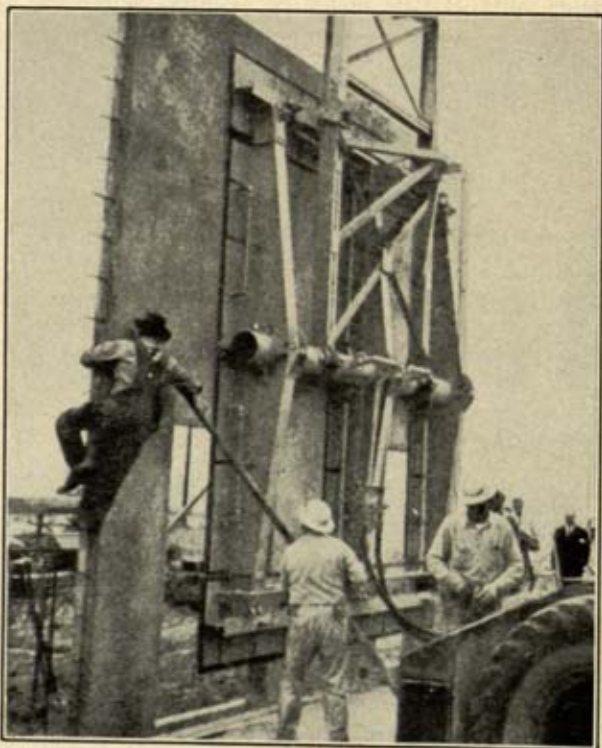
Setting a wall panel in position with a vacuum lifter. (*Western Construction.*)
